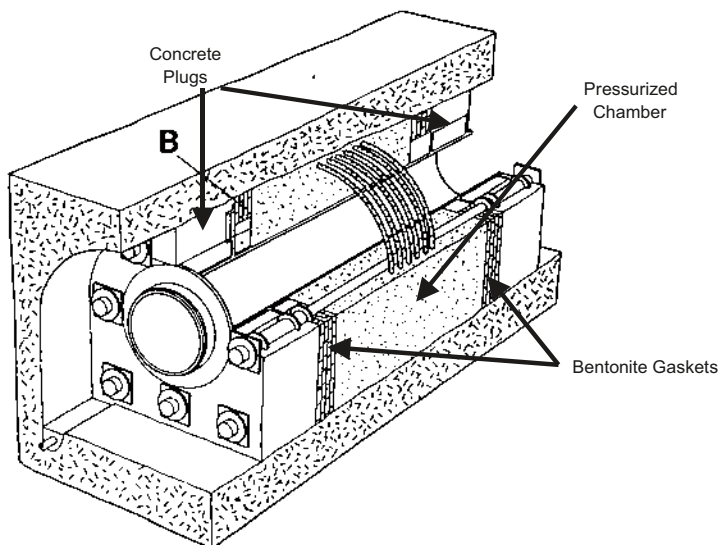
Layout of the Tunnel Plugging Test /after Pusch et al. 1987b/.
